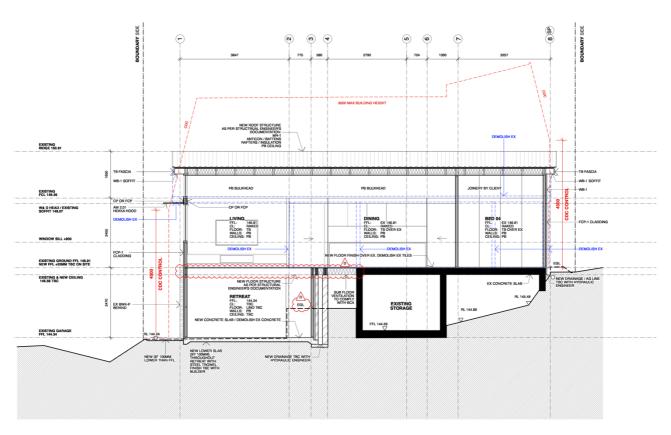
CDC Section AA 11 Jones Street, Beacon Hill
